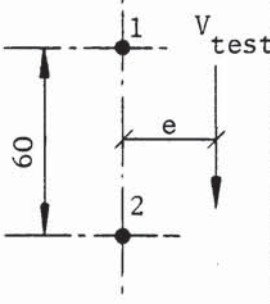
LOADING AND BOLT SPACING ARRANGEMENT
